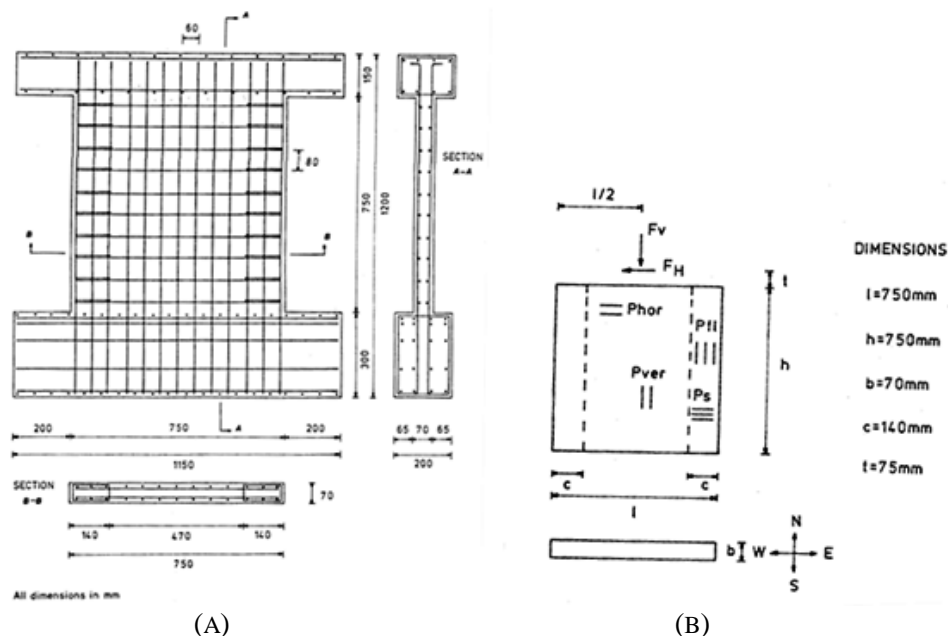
TYPE I RC SHEAR WALL. (A) REINFORCEMENT DETAILS, (B) REINFORCEMENT PERCENTAGES^[206].
